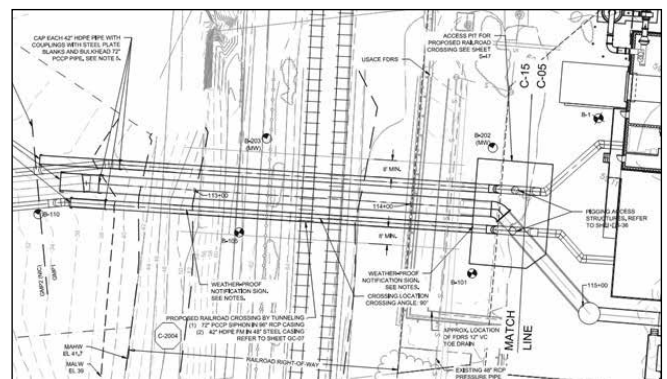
Excerpt from project plans showing trenchless crossing below FDRS and Amtrak Railroad
